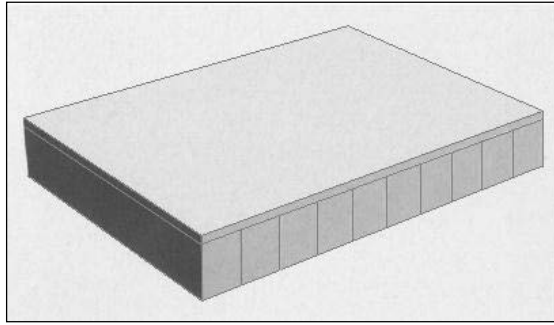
Butt-jointed solid timber joists (Kolb 2008)
